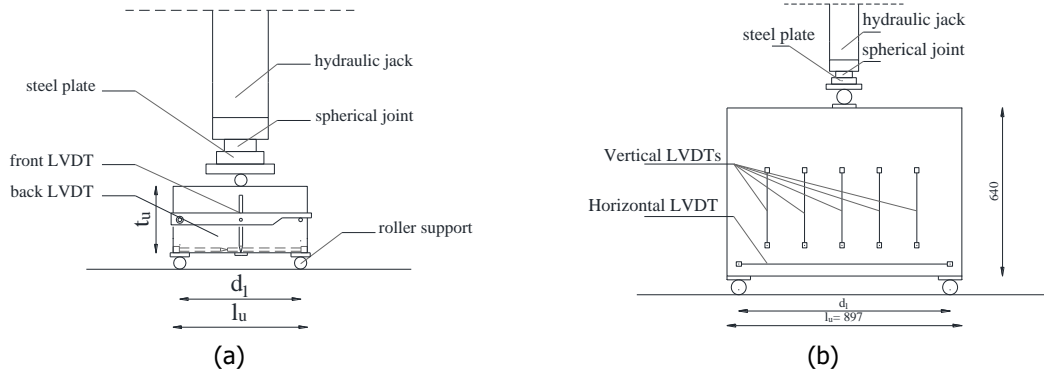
Three point bending tests: (a) sawn-cut specimens (TUD-E-54); (b) in-plane bending test on full-scale element (TUD-E-55).
